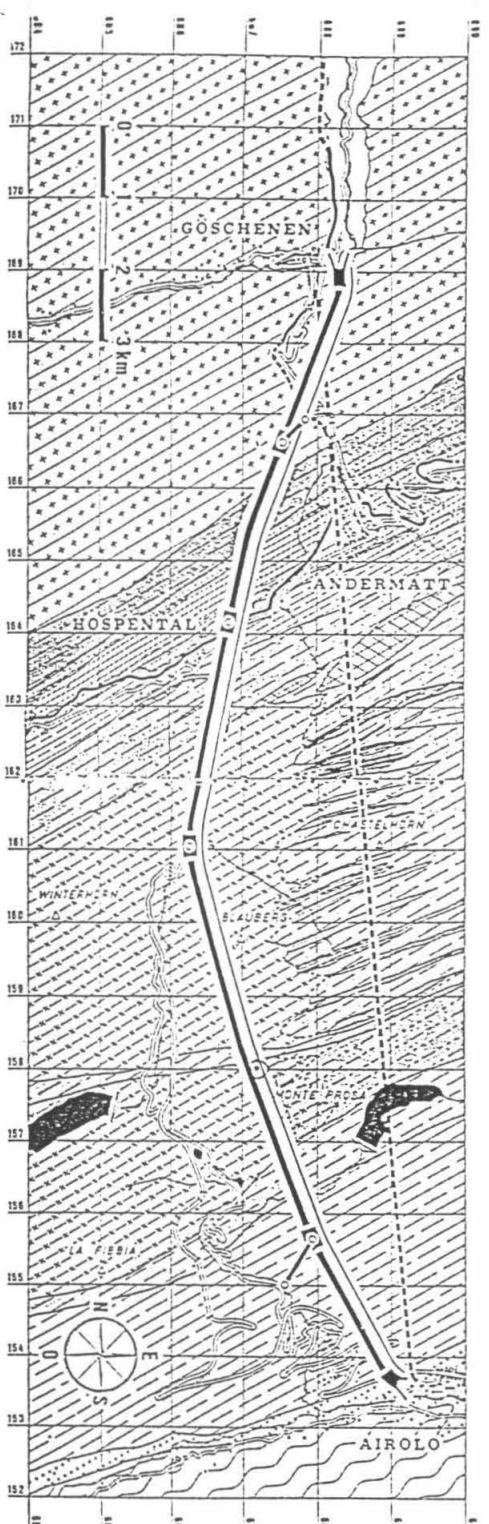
Cross section of St. Gotthard Road Tunnel.
